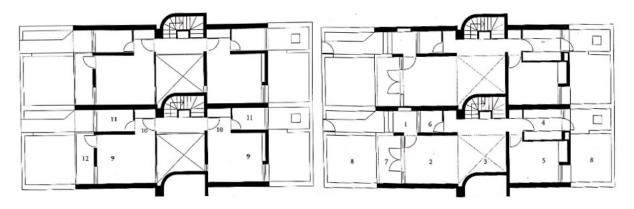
Ground and first floor plan of Readers quarters row houses
